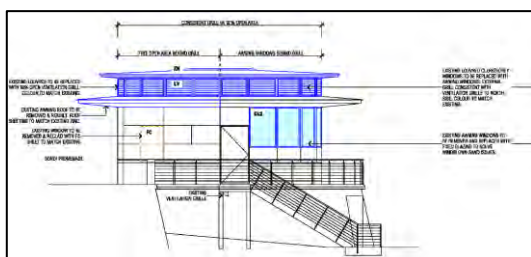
Approved east elevation of Lifeguard Tower, Tunnel 2 and Amenities block.
